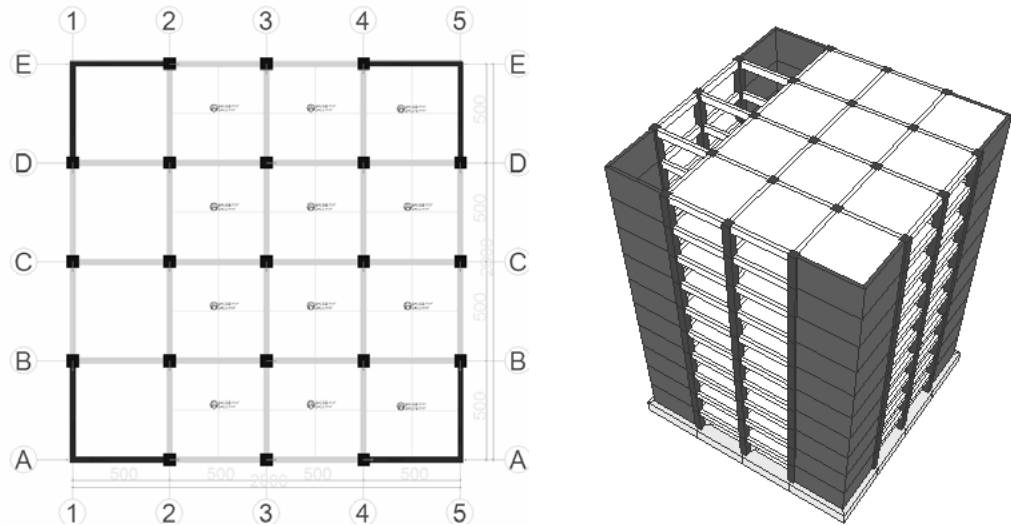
Structural plan and 3D view of parametric model IIIi
